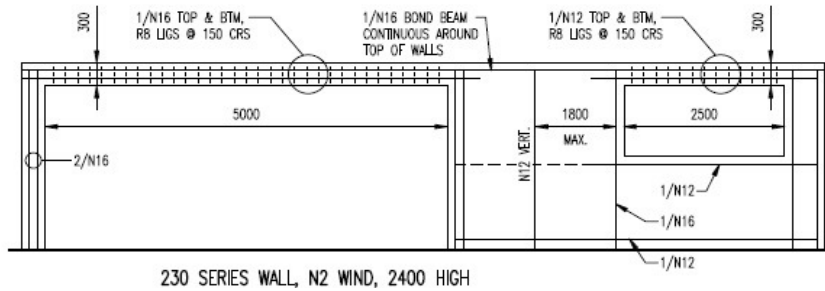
2400 High Wall, N2 Wind Rating, 230 Series ECO-Block (Max. roof load width: 5.2m)
